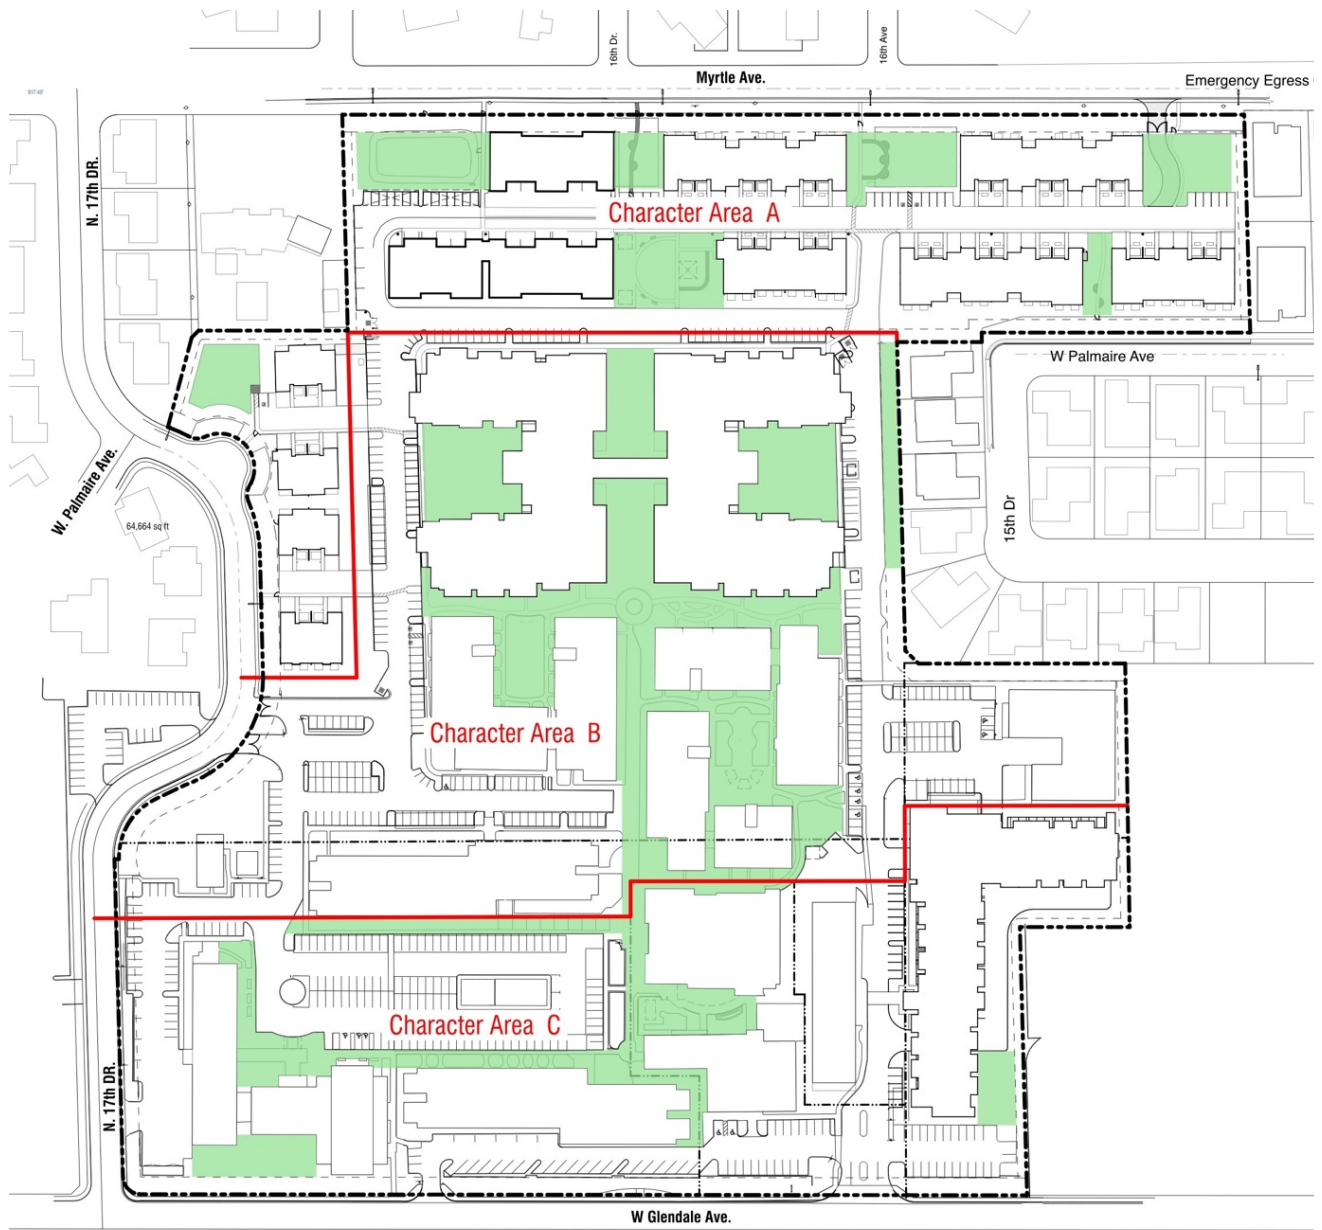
MAXIMUM BUILDING HEIGHT STANDARDS PLAN
